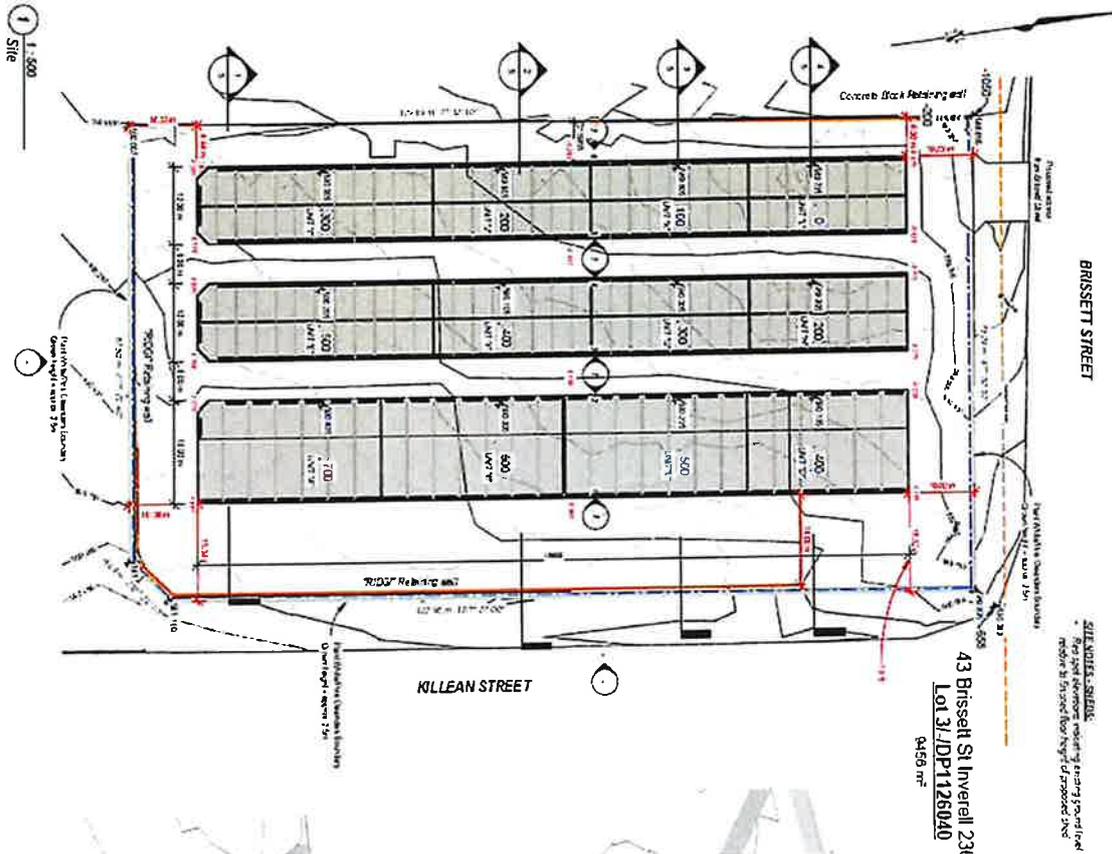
Proposed Site Layout Plan (by Abode Building Design).
